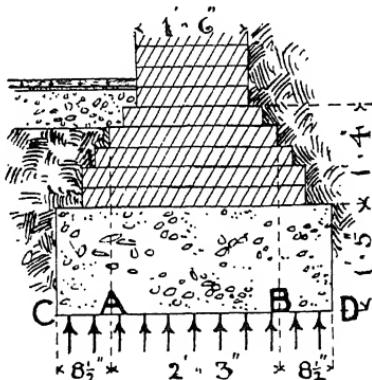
Ordinary Foundations of Concrete and Brick.
